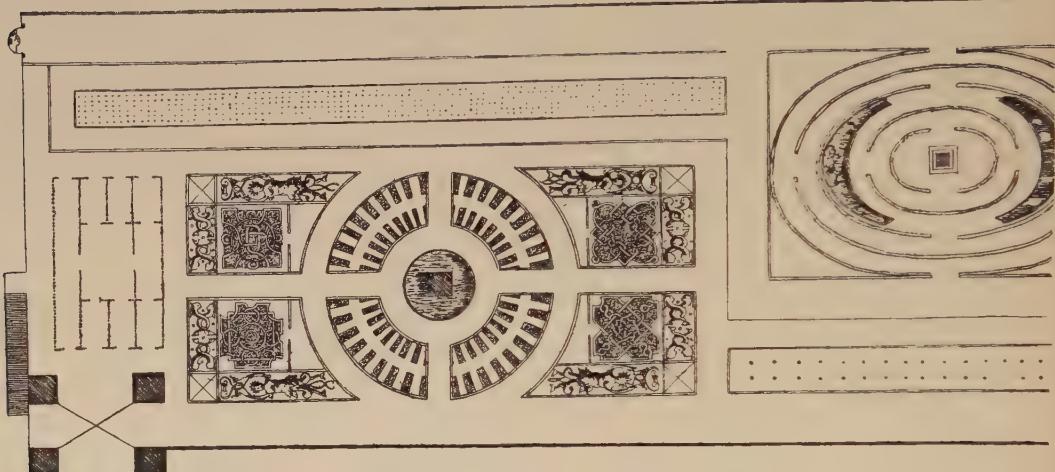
HEIDELBERG CASTLE—PLAN OF THE GARDEN
